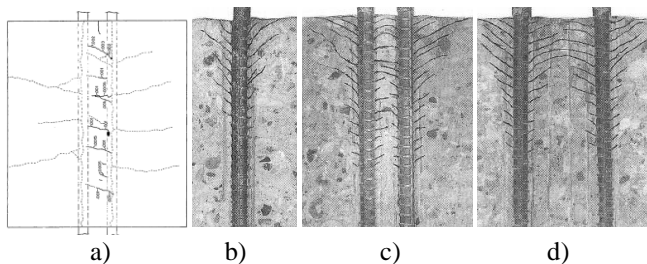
Internal cracking: a) cracks around 32 mm bars with 5.5 mm rib spacing (top) and 7 mm (bottom) (Goto 1971), b) crack width variation within 38 mm cover (Beeby 1978)
